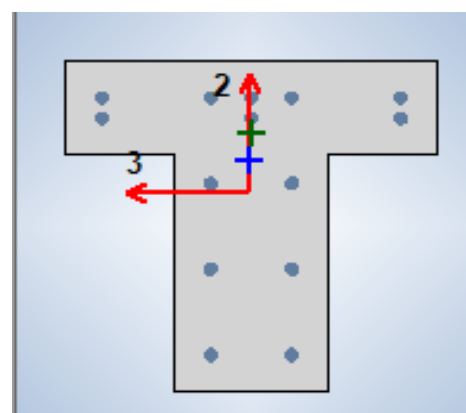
Cross Section of RC T-Shaped Column (Model-04)
